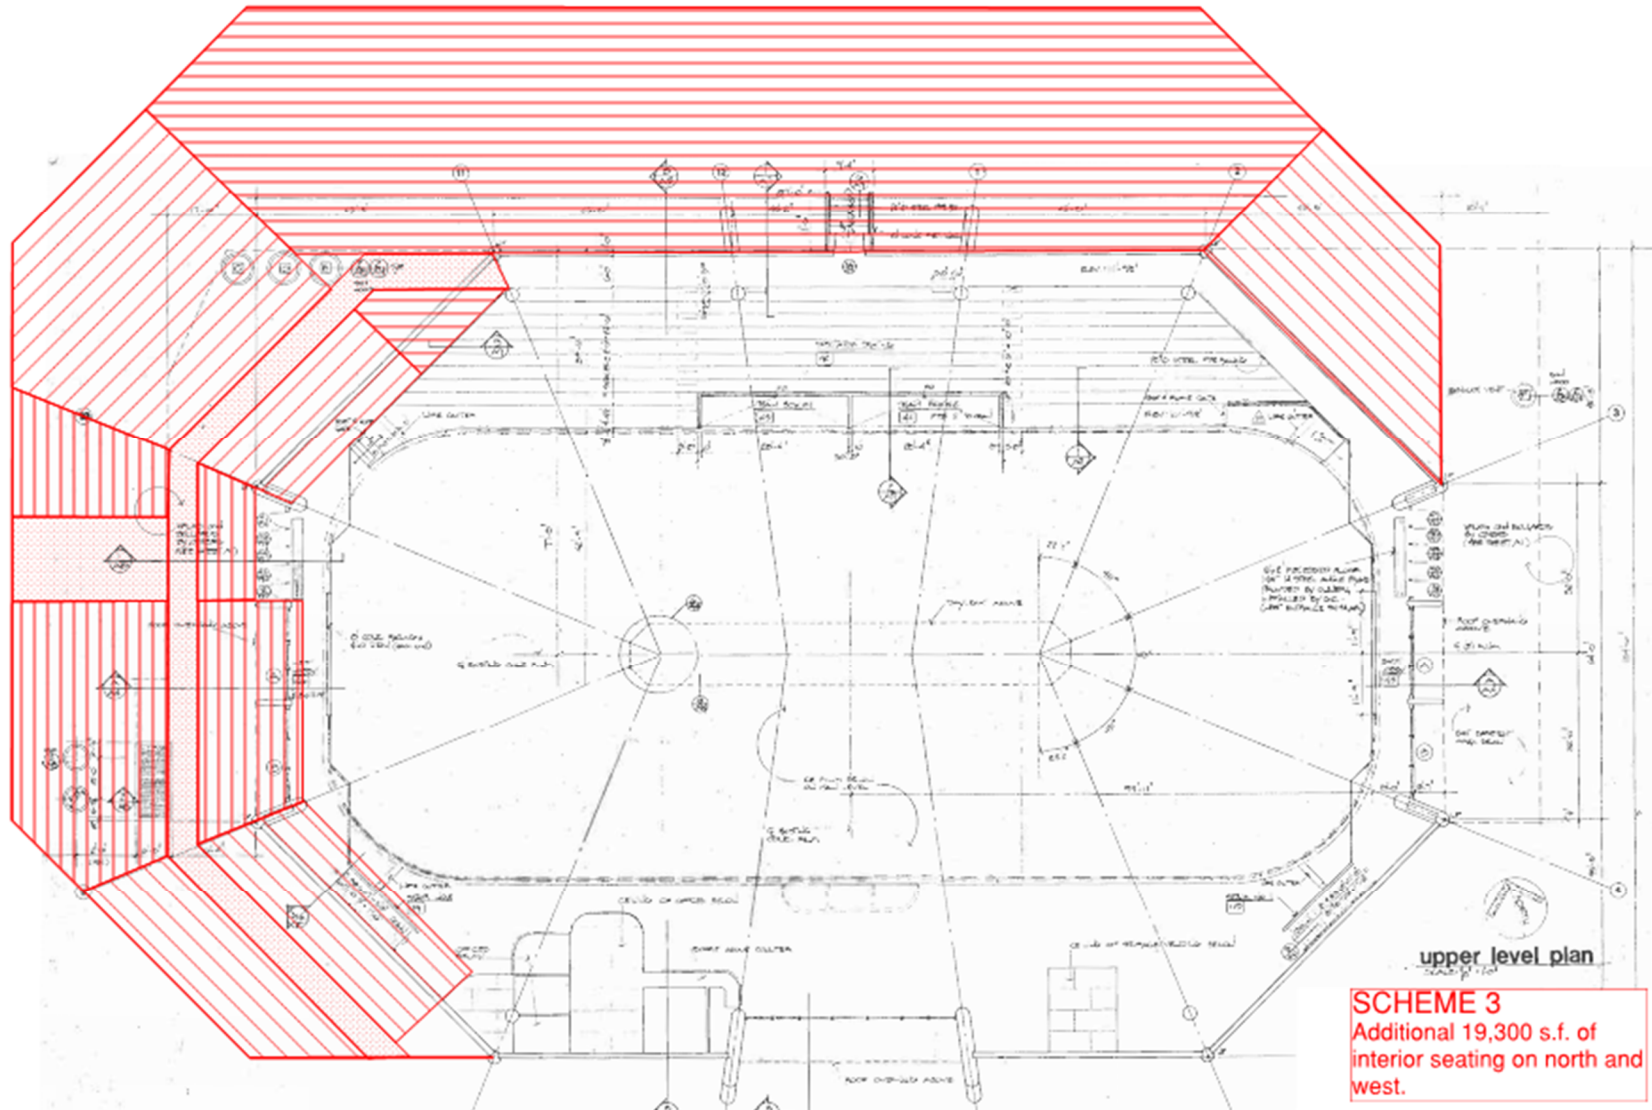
Plan of new seating in Scheme 3, north and west of existing building; new roof structure required; seating from Scheme 1 could be added
